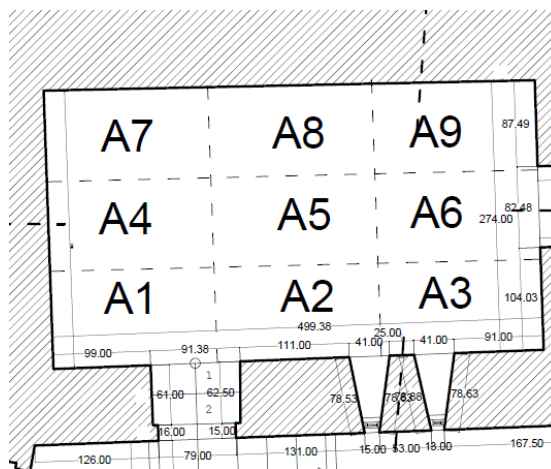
B1 Room plan (TEMA 2008, Organized by Author)
